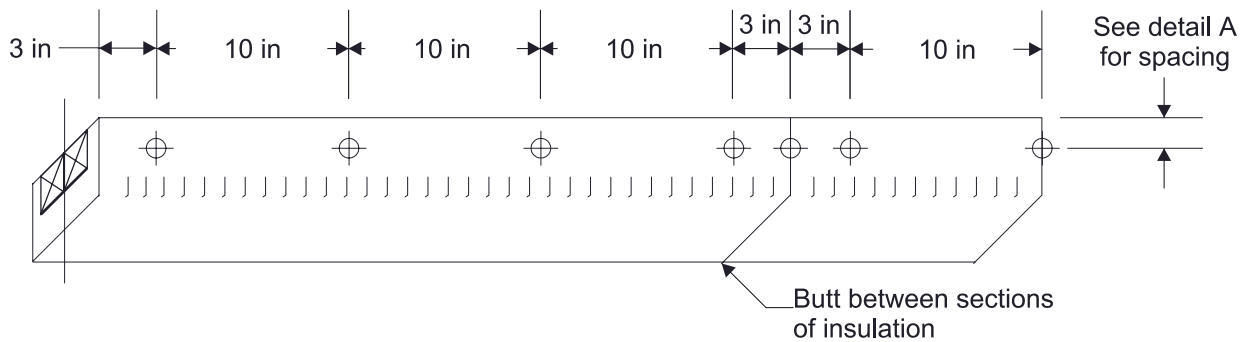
Detail B - stud spacing on 4-in x 4-in stiffener (projection view).
